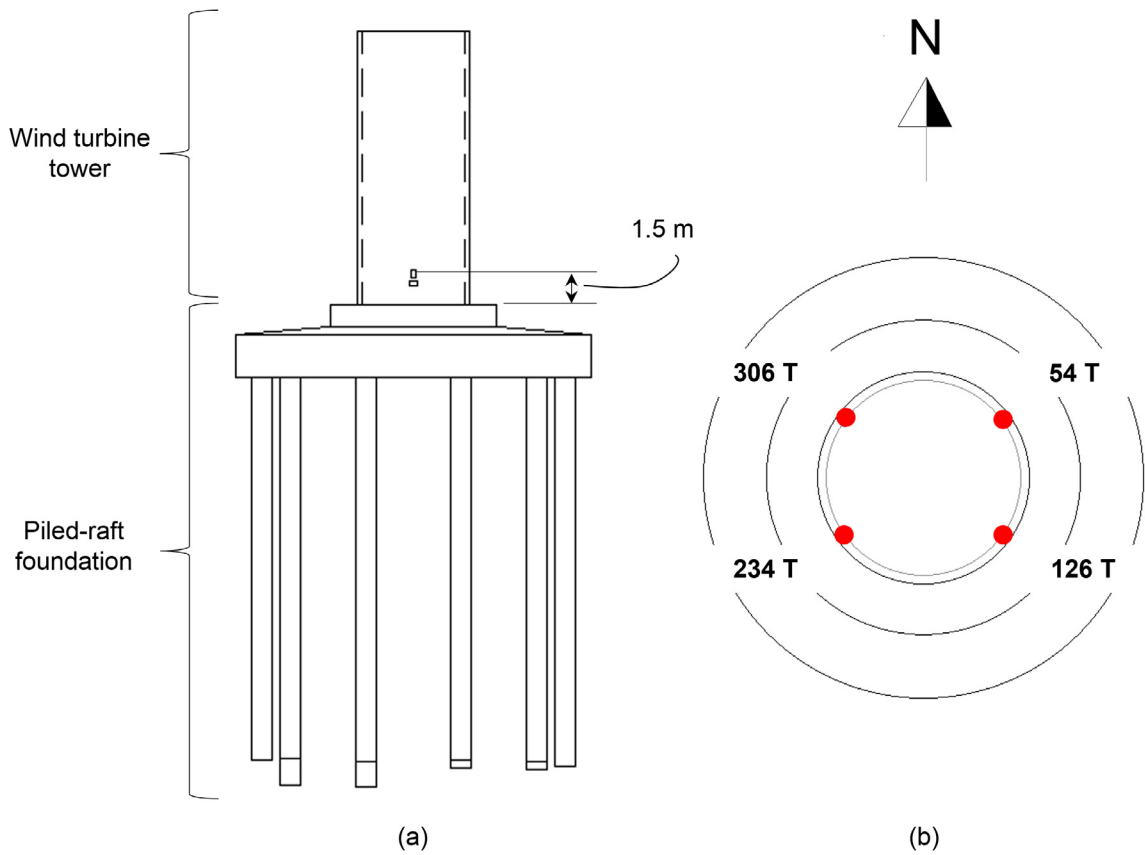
Strain gauge installation positioning: (a) elevation and (b) plan view of the foundation and turbine tower.
